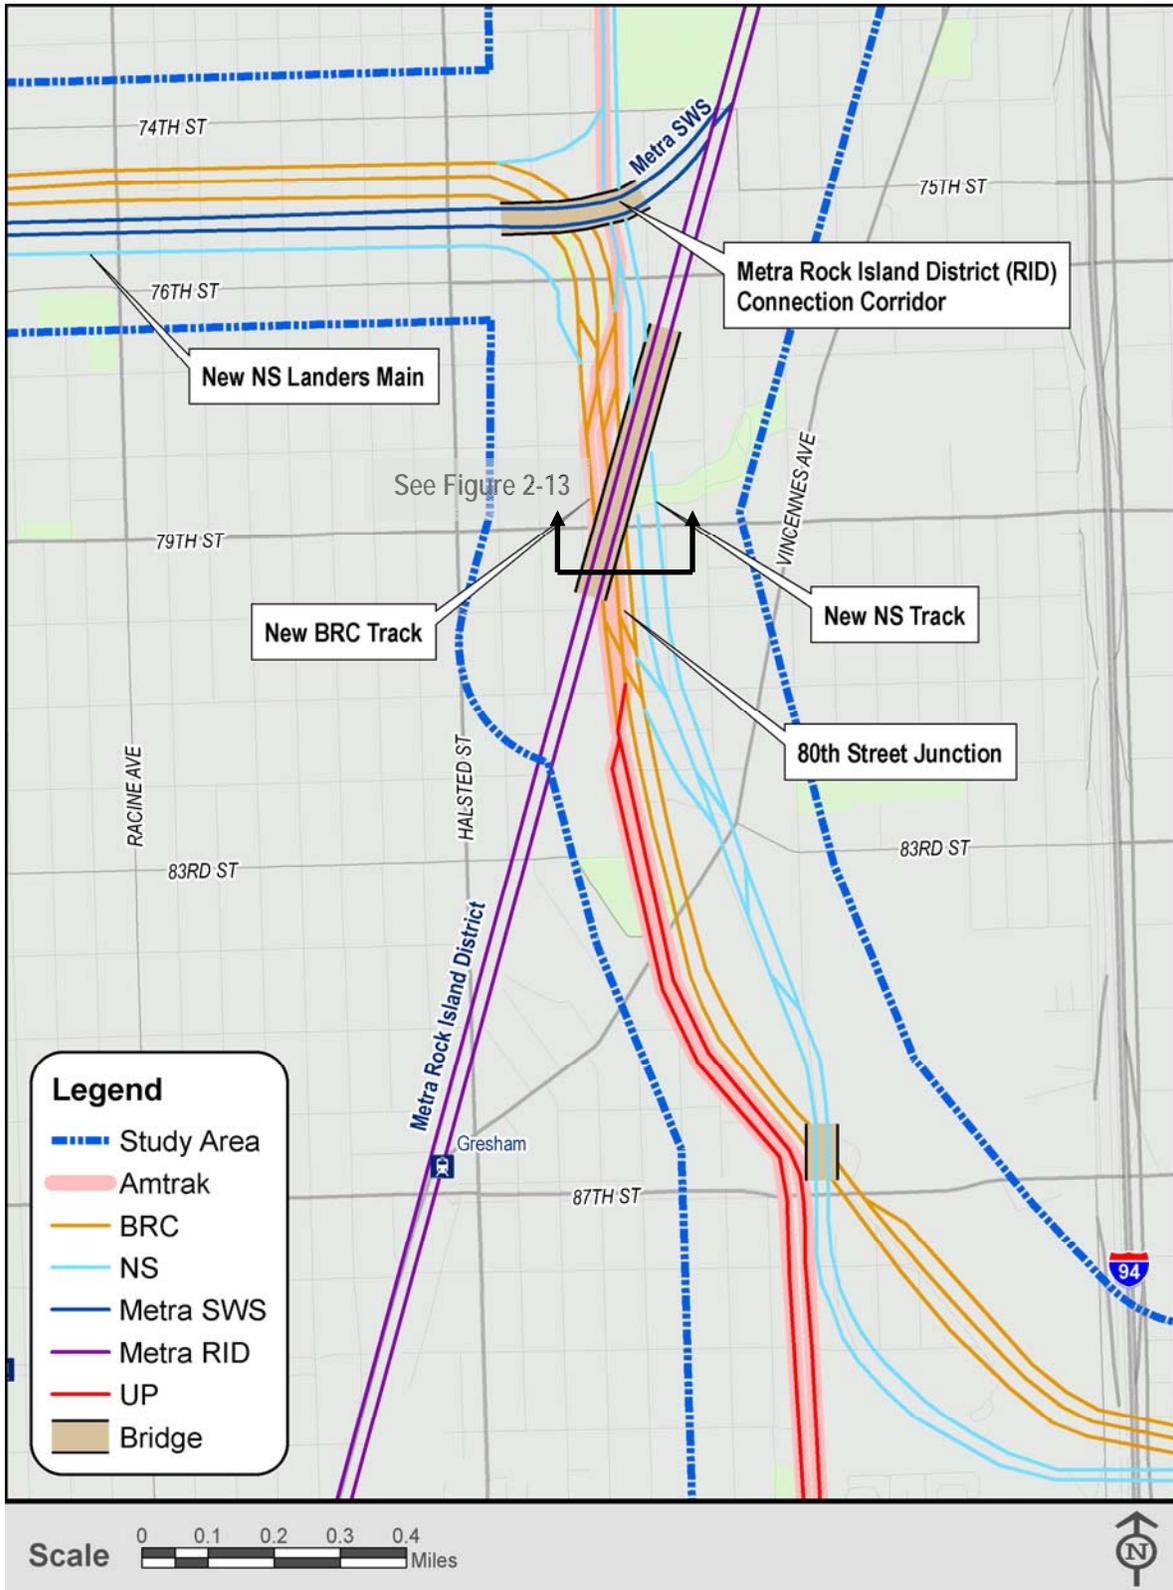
Alternate 80-1 Proposed Track Schematic – 80th Street Junction
